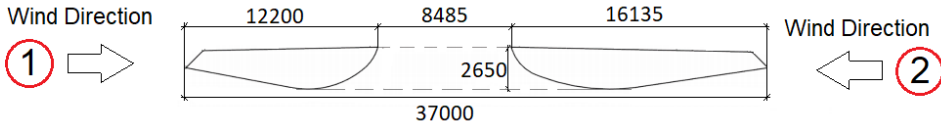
Wind direction and deck dimensions [mm] [12].
